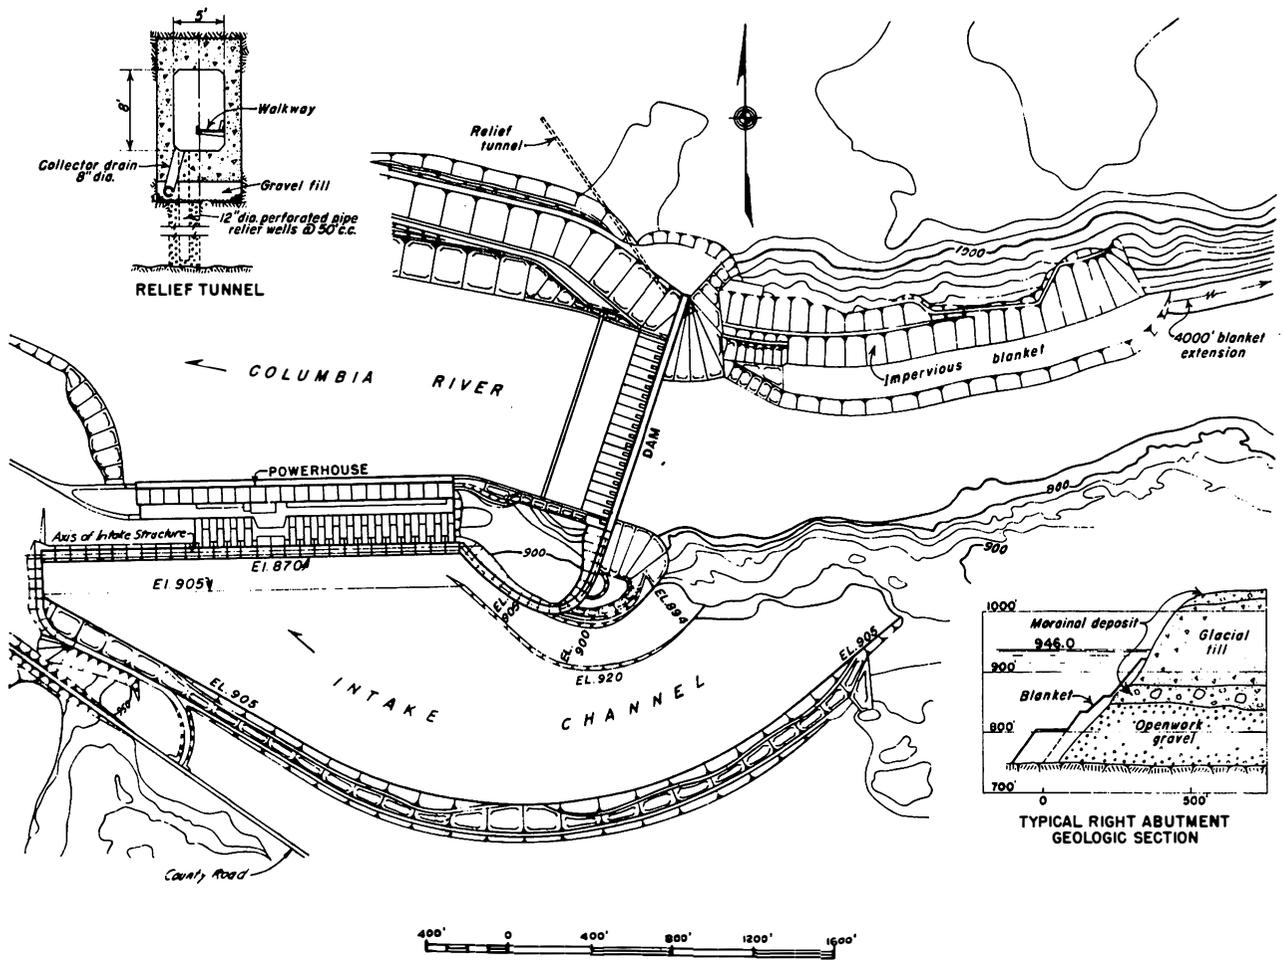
General layout of Chief Joseph Dam with details of impervious blanket and relief tunnel required to control seepage in the right abutment.
